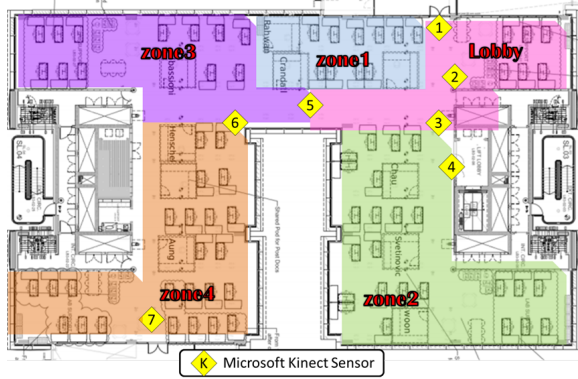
Distribution of 7 Kinect sensors on a building's floor layout.
